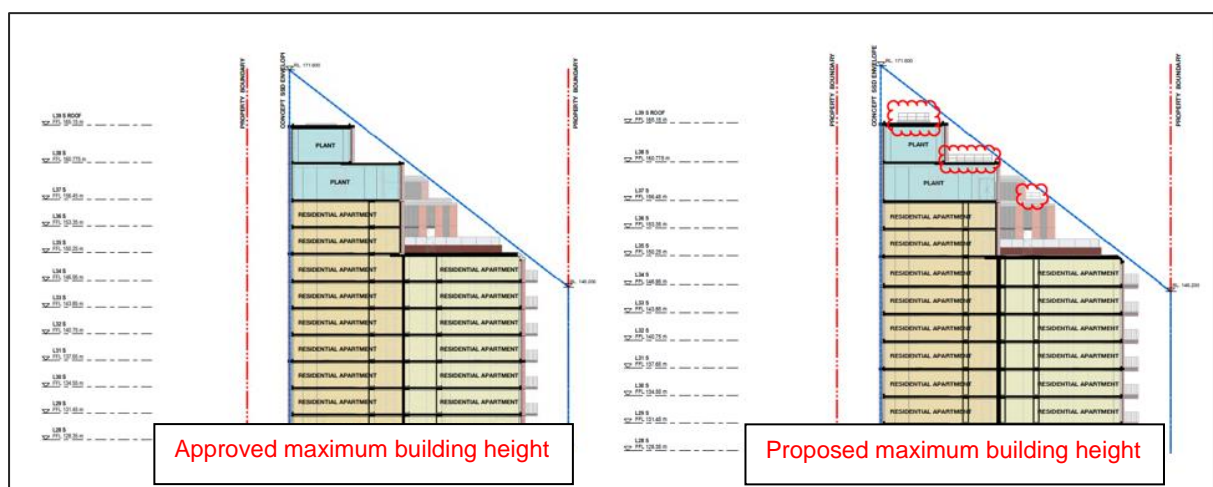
| Proposed building height increase to include minor roof top protrusions (Source: approved and proposed plans)
